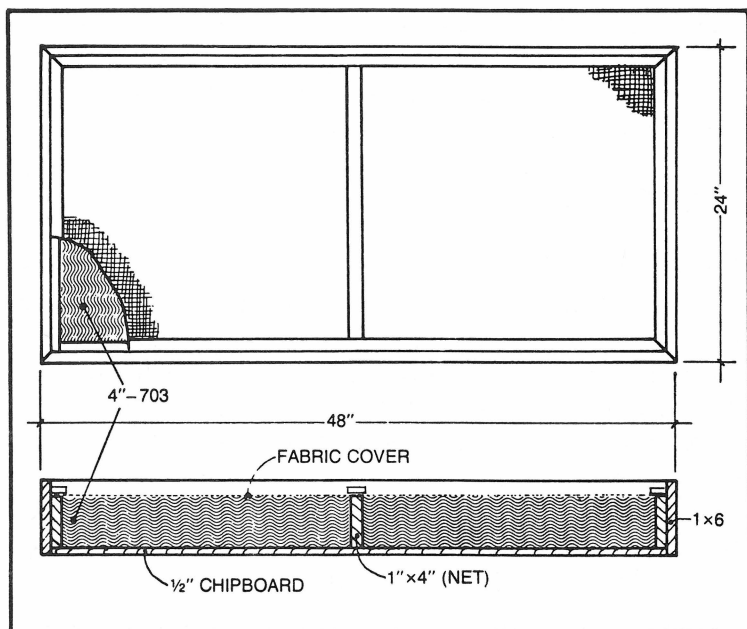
Constructional details of the 2 foot \times 4 foot wideband wall modules. These are basically 4 inches of 703 glass fiber with mechanical protection and cosmetic cover.
